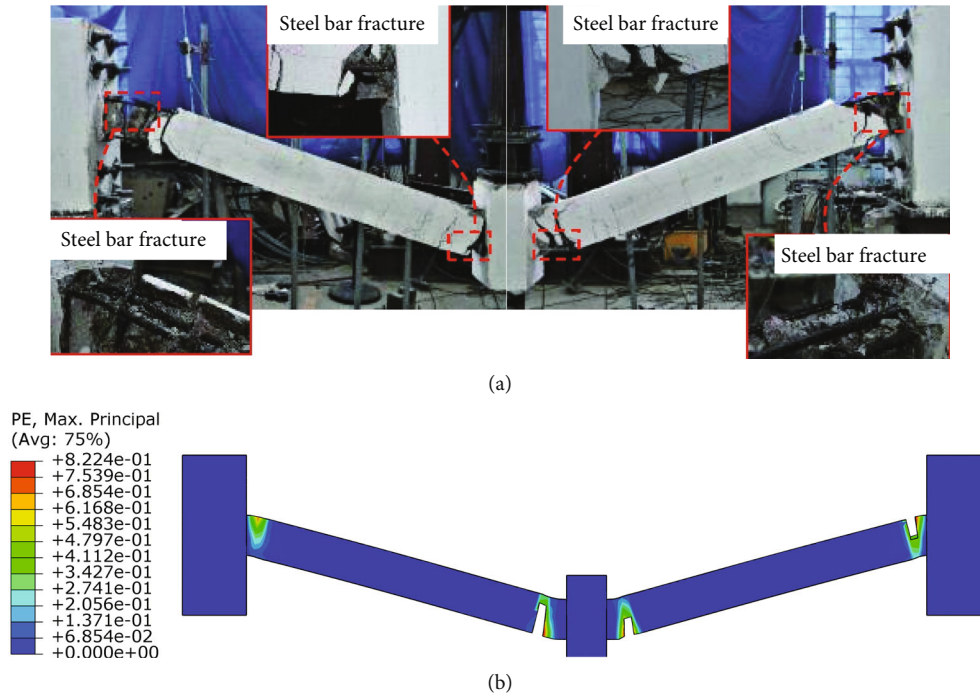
Comparison of BS-15-5 specimen test crack and FE crack mode. (a) Specimen failure diagram. (b) FE simulation crack diagram.
